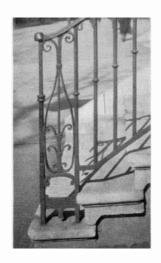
Plate XLII.—Iron Stair Rail and Footscraper, South Seventh
